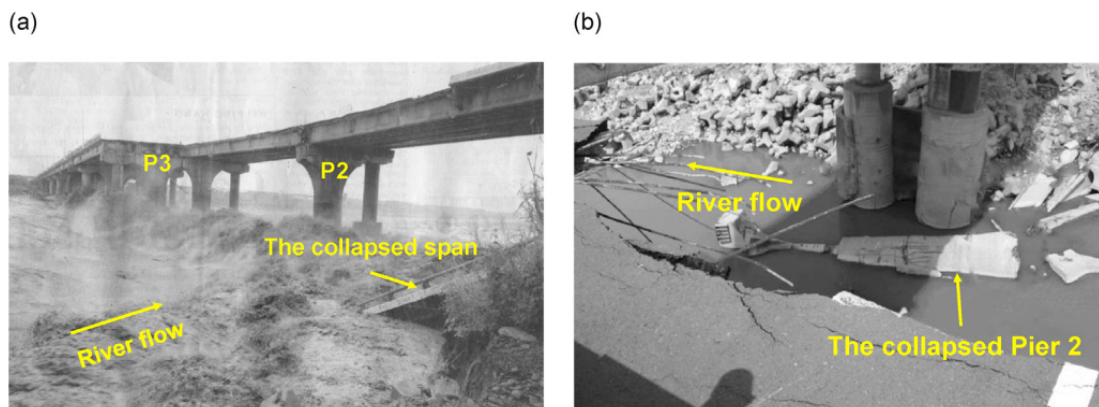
Photographs of Houfeng Bridge. (a) Bridge collapsed. (b) Remnant of pier 2
